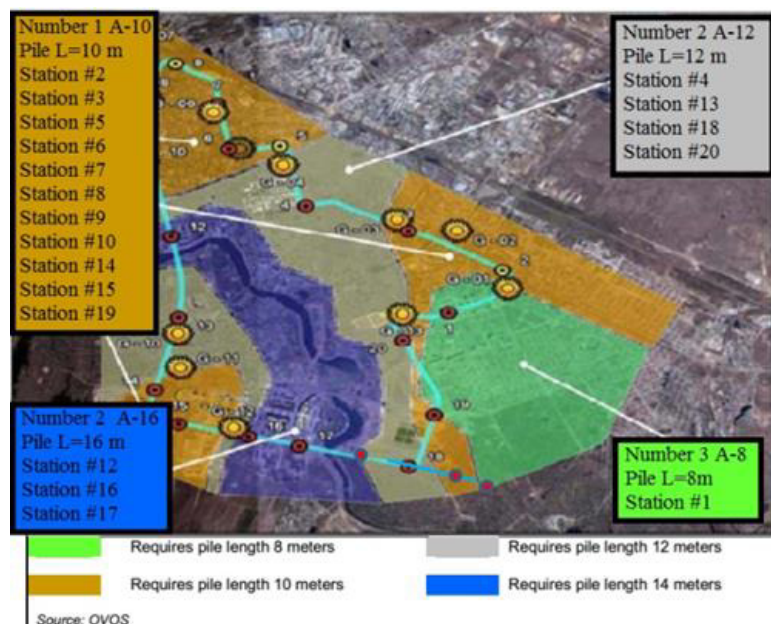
A Plan of required pile depth on ground conditions for Project of LRT.
